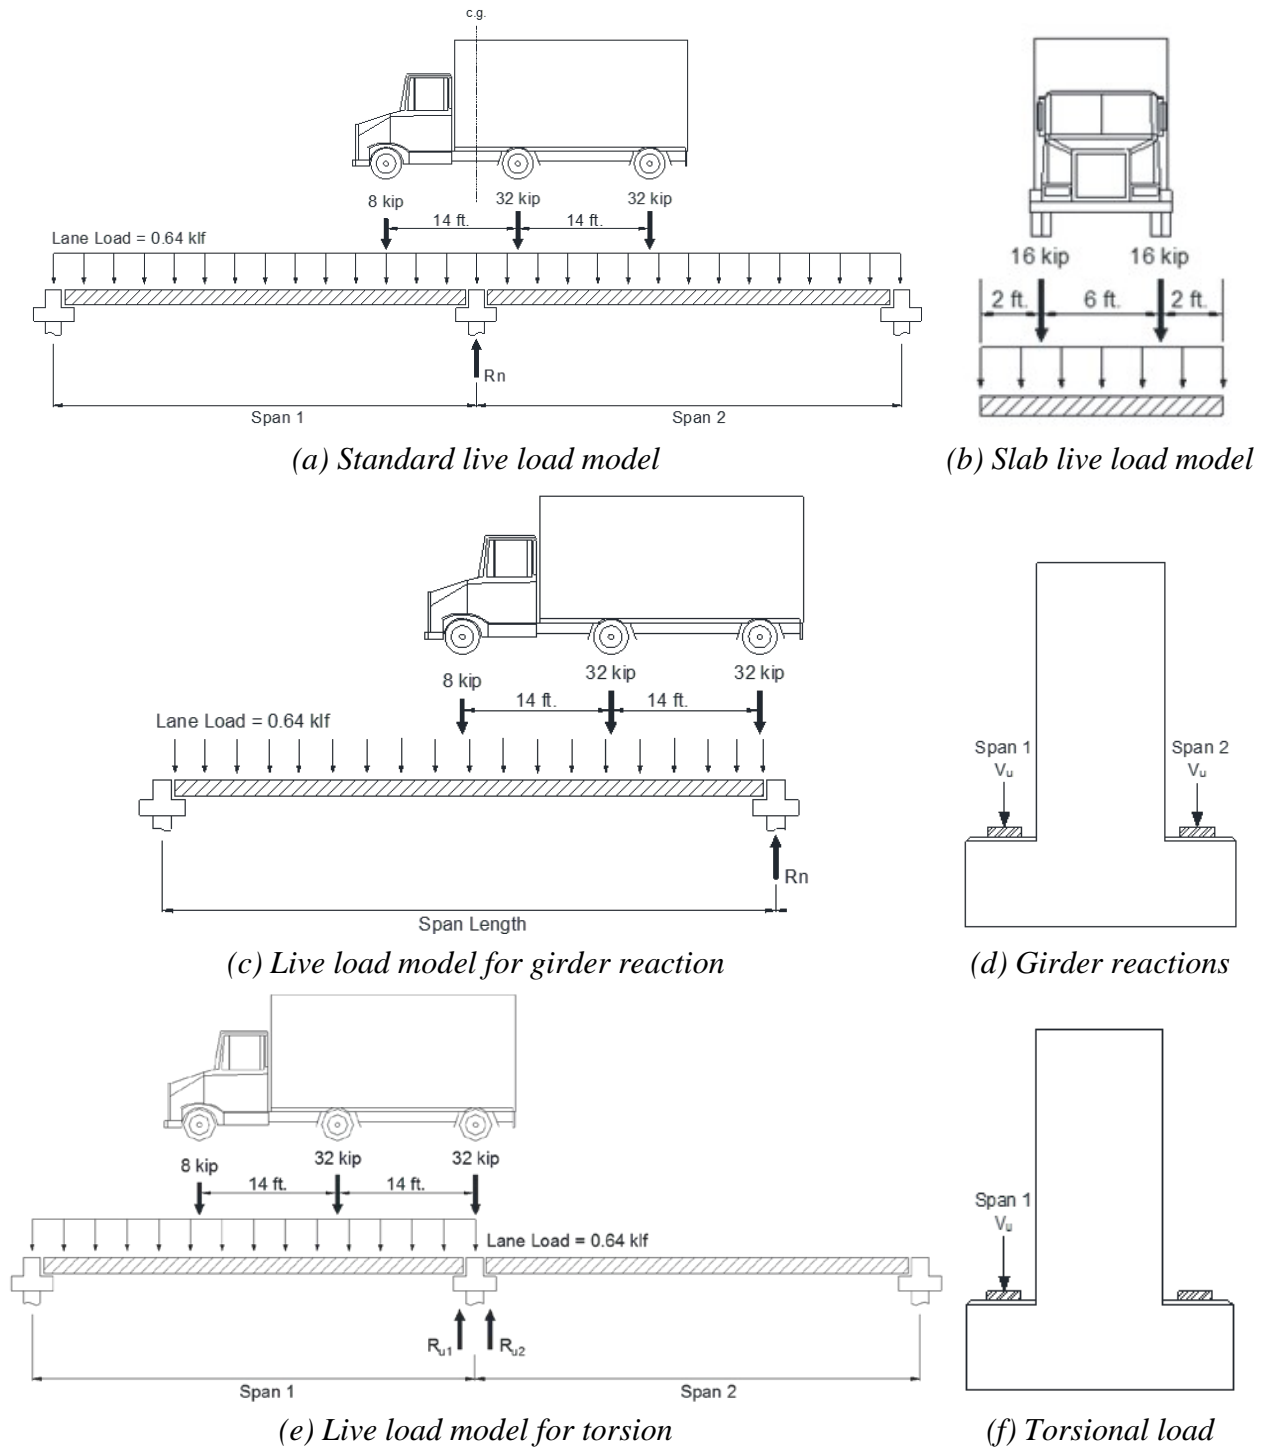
Live Load Models on Girder Used for the Computation of Girder Reaction and Torsional Load.
